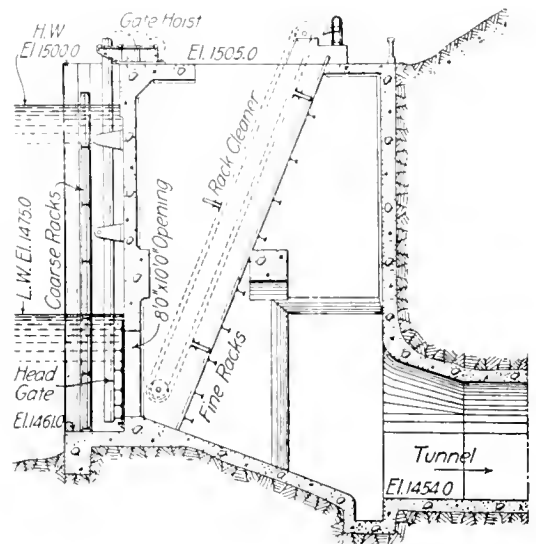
Tunnel Intake, showing Racks, Rack Cleaners and Gates
